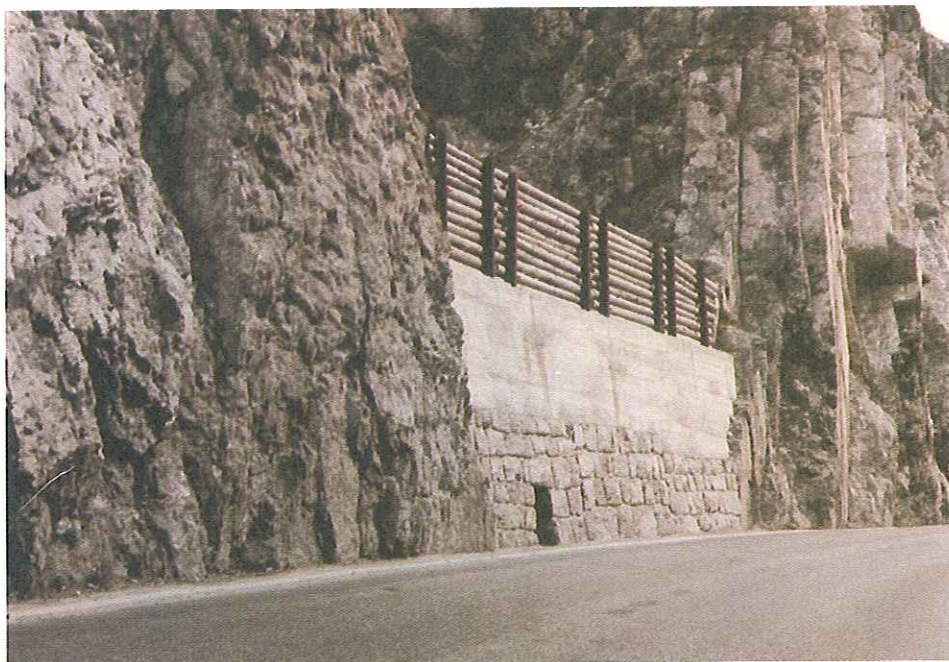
Combination catch wall on a road in Switzerland. The wall height has been increased as the volume proved inadequate because of not cleaning behind the wall.
